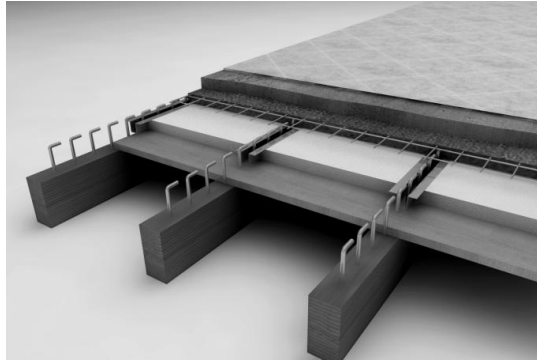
Render of the hybrid composite floor with timber beams, steel fasteners, wooden plank, steel mesh, and covered by a tile flooring.
